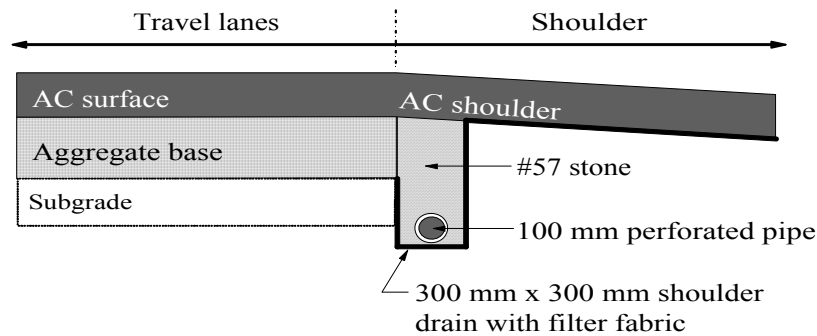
Typical AC pavement with pipe edgedrains (ERES, 1999).
